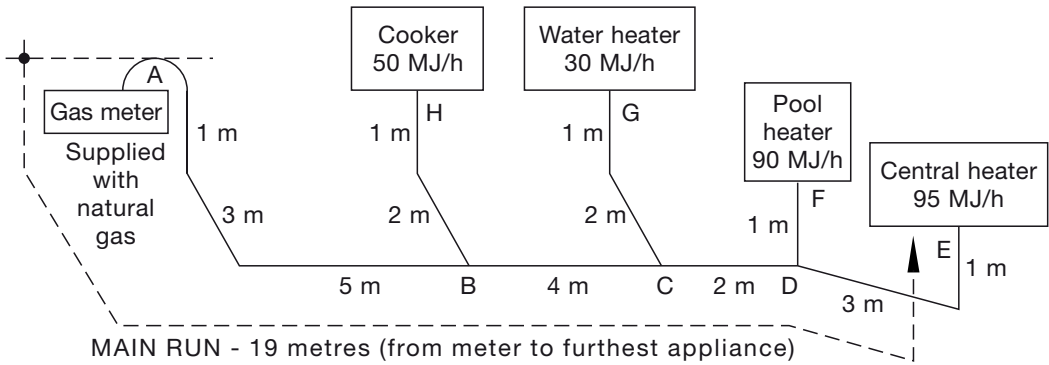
EXAMPLE OF CONSUMER PIPING LAYOUT
